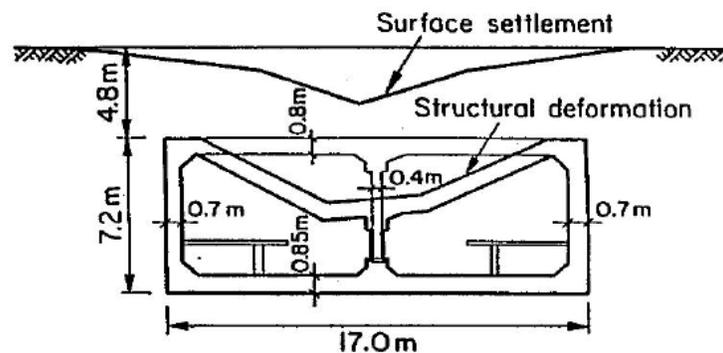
Daikai Subway Station Collapse – 1995 Kobe Earthquake, Japan
